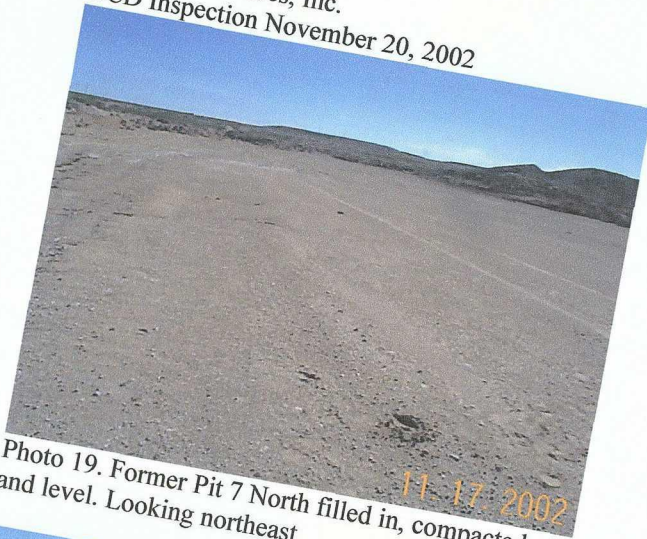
Former Pit 7 North filled in, compacted and level. Looking northeast.
